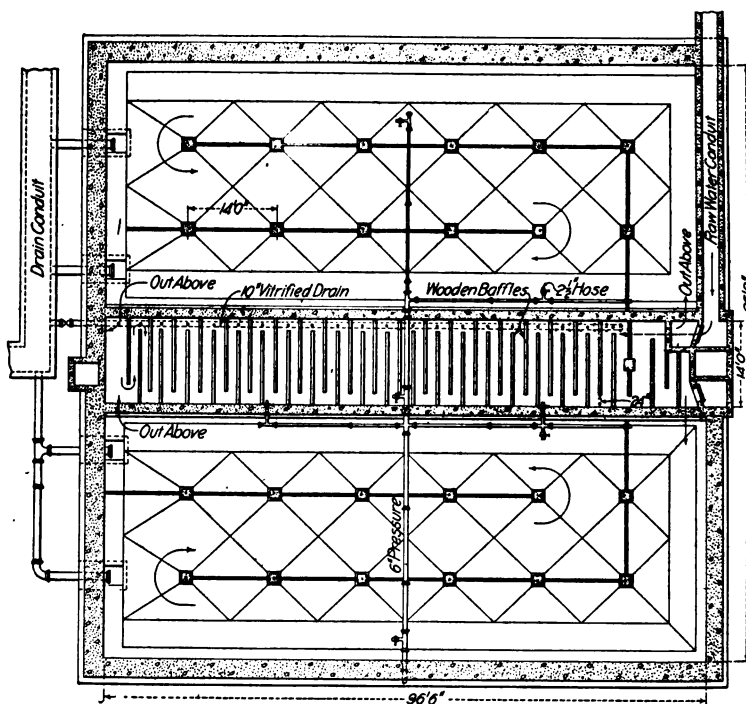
Plan of Mixing Chamber and Coagulating Basins, Showing Baffles.
